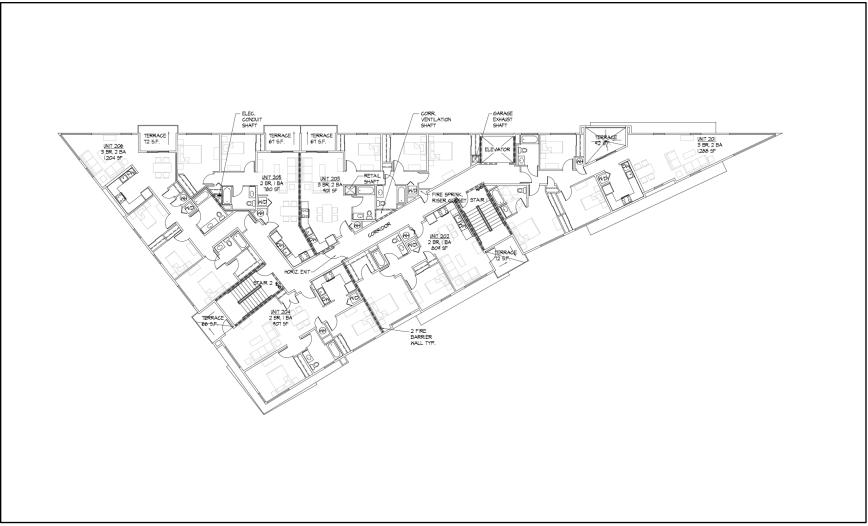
Project 2nd, 3rd, and 4rth Floor Plan
